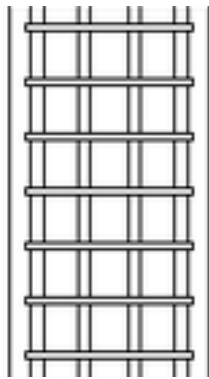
Schematic representation of concrete cylinders with hoop transverse reinforcement
